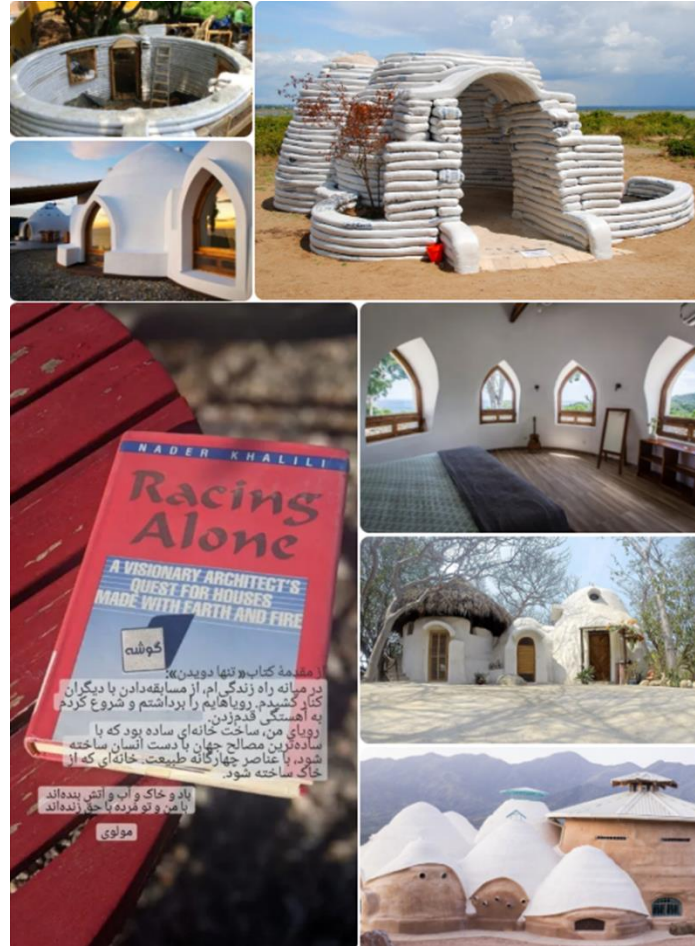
A house of wind, Earth, water, and fire (Azadeh, 2020).
